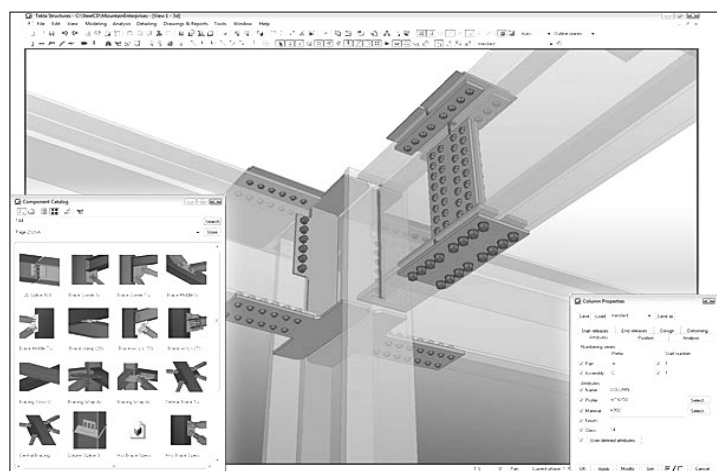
, Example of a model of structural steel with deviations in detailing, (Source unknown)
